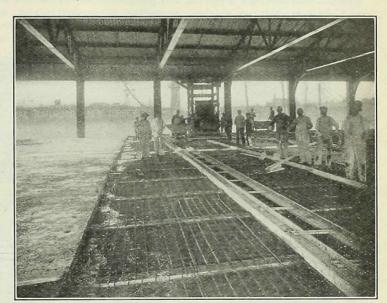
PORTABLE TRACK, REINFORGEMENT AND CONCRETE SPREADERS IN FOREGROUND.
